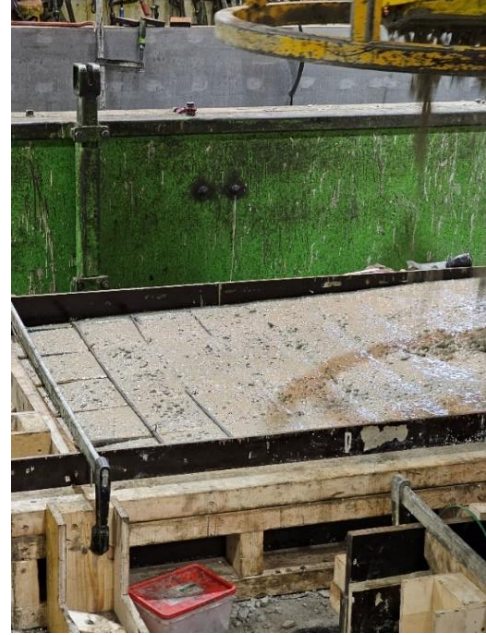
Concrete mix is added onto reinforcement in the mould. Taken on 05.02.2024, at Klepp
